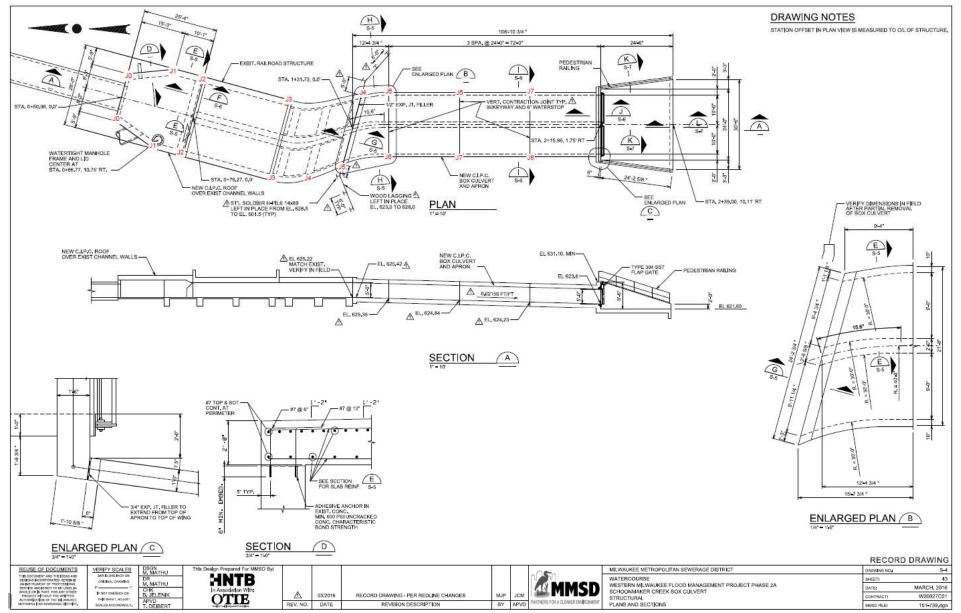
Schoonmaker Creek Culvert Joint Locations
